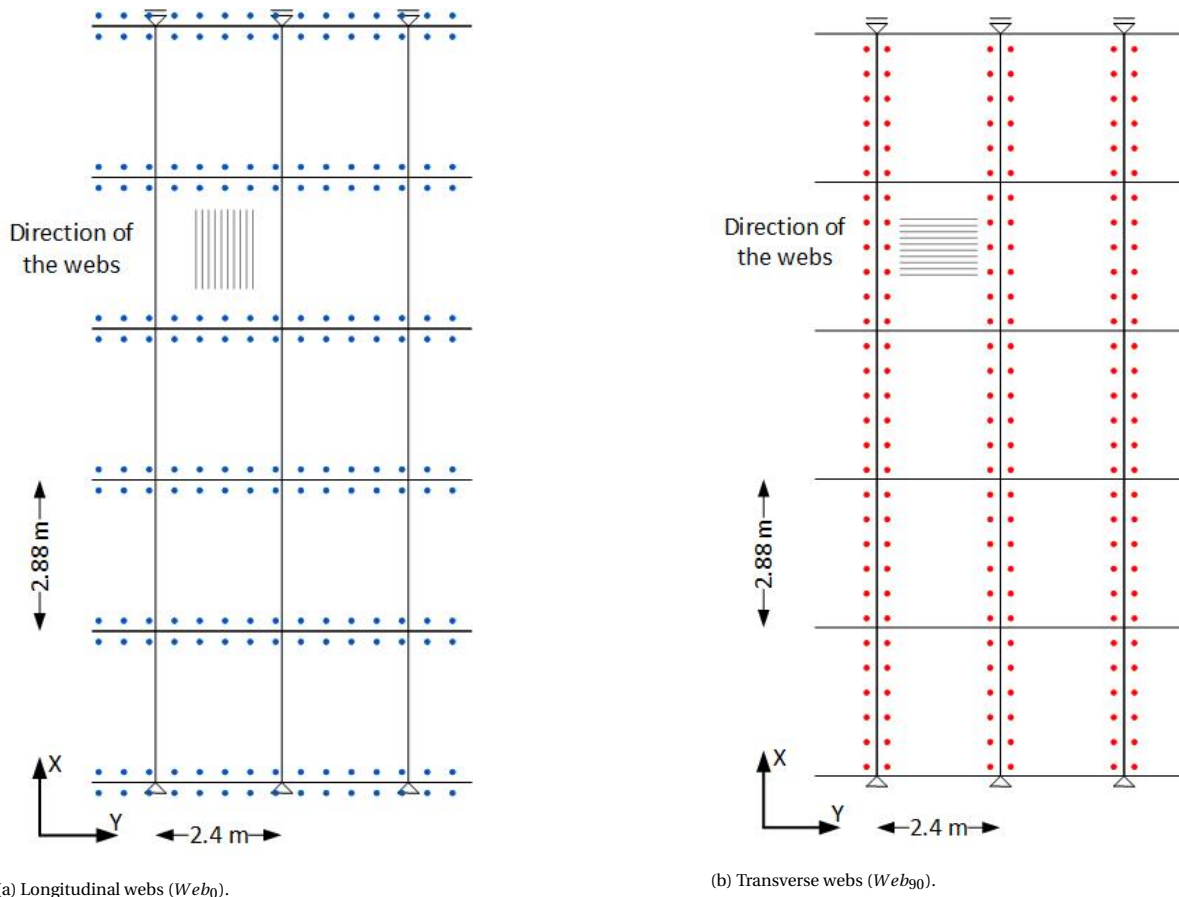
The dimensions of the FRP deck and layout of the connection to steel girder.
